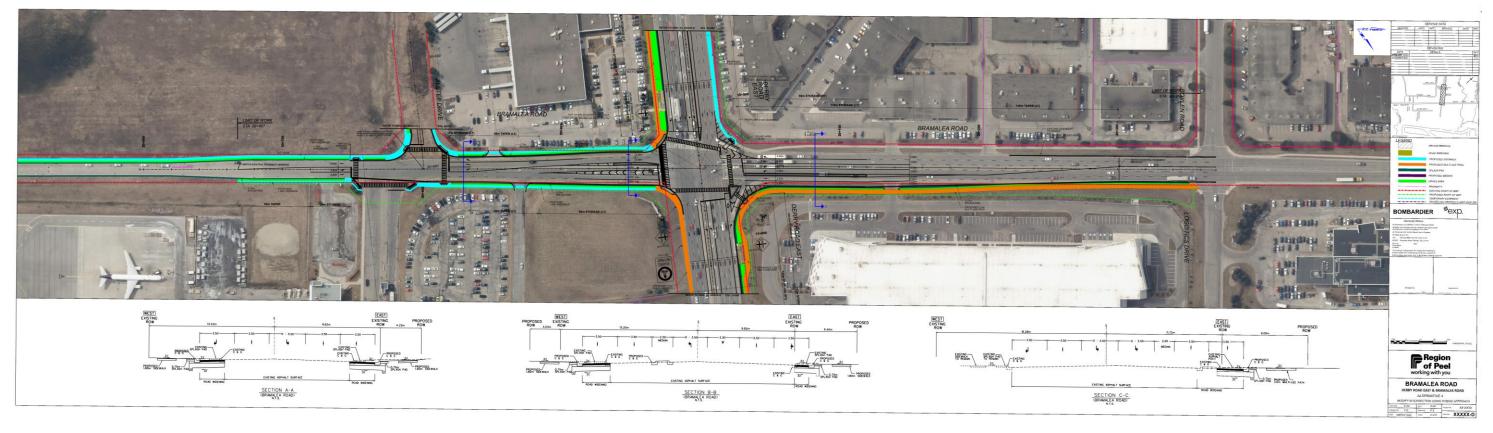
Derry Road East & Bramalea Road Preferred Alternative Design Concept (Bramalea)
